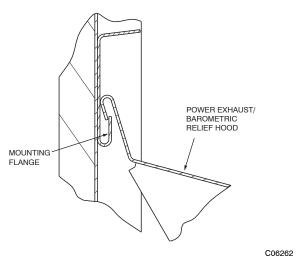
Barometric Relief/Power Exhaust Hood Flange
